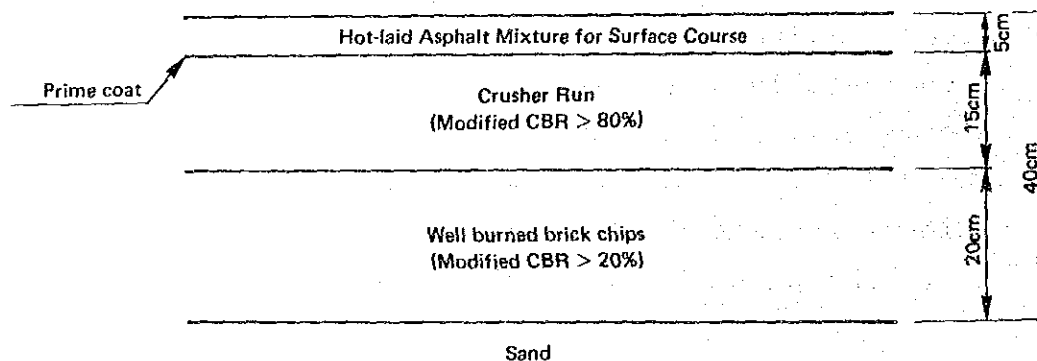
Paving Sectional Construction of Parking Lot
